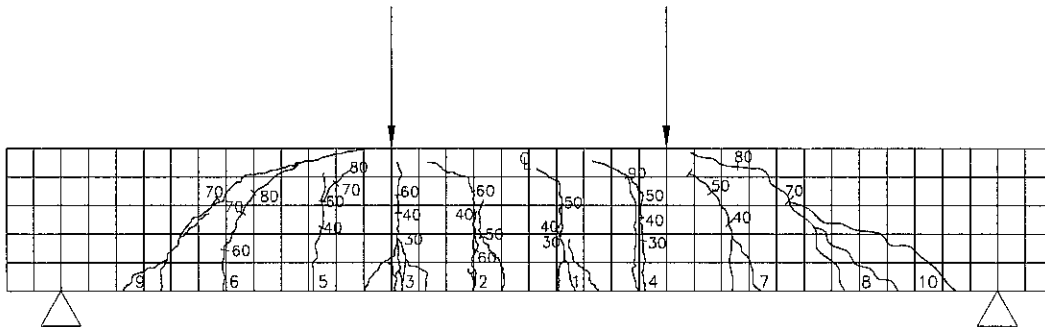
22. Crack pattern of Normal Concrete beam specimen (shear failure)
